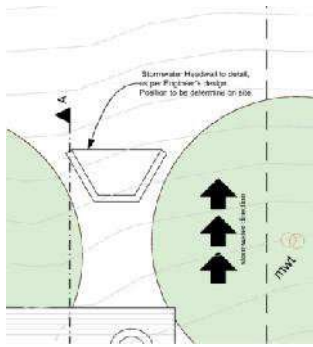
Position of the stormwater headwall (DEM TECH, 2020)
